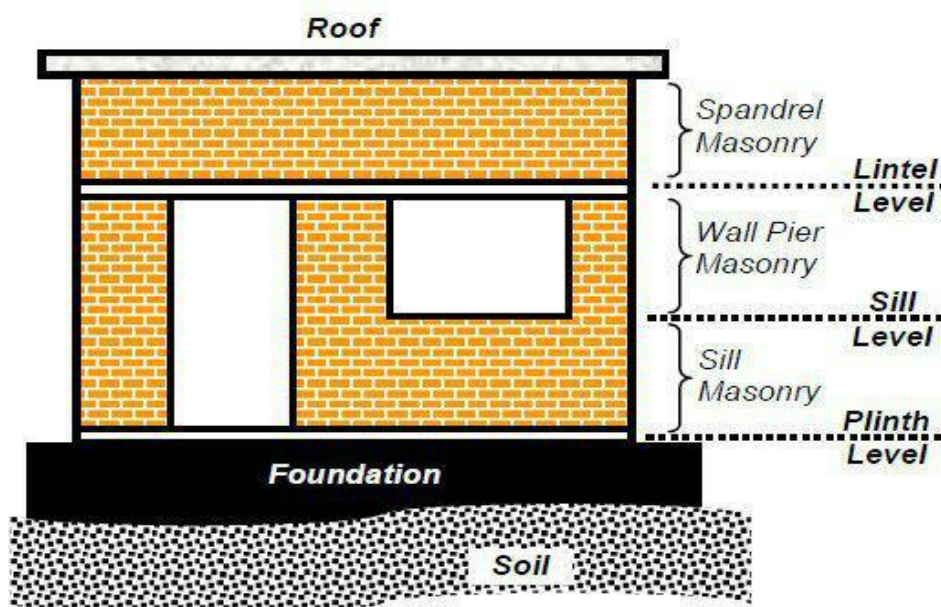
Sub-units in masonry building – walls behave as discrete units during earthquakes.
